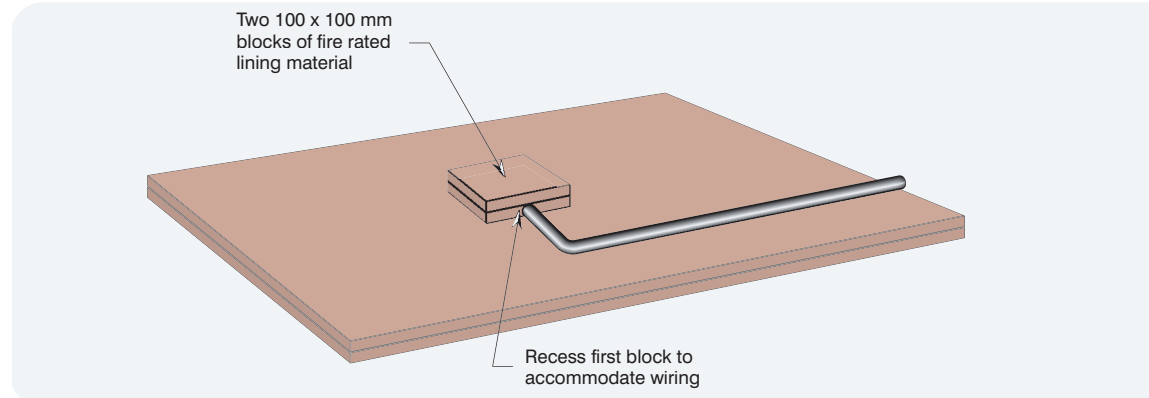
Electrical service penetration in fire- and sound-rated wall and floor/ceiling.
